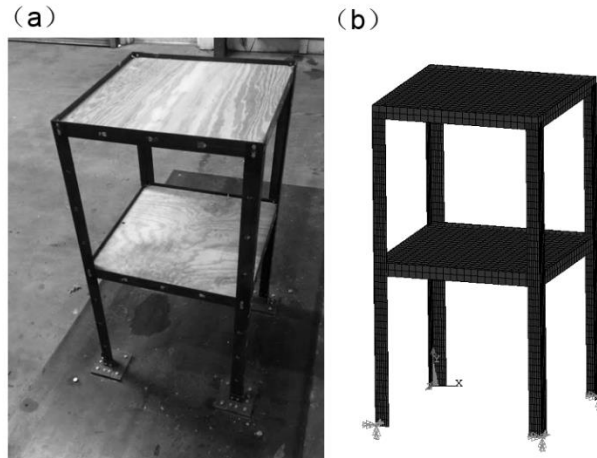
(a) Assembled steel frame model with wood floor mounted to both floors; (b) extruded view of FE model.
